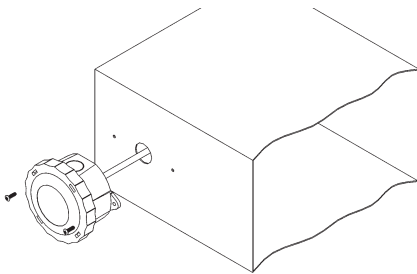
Weatherproof Box WB Mounting Holes and Installation
